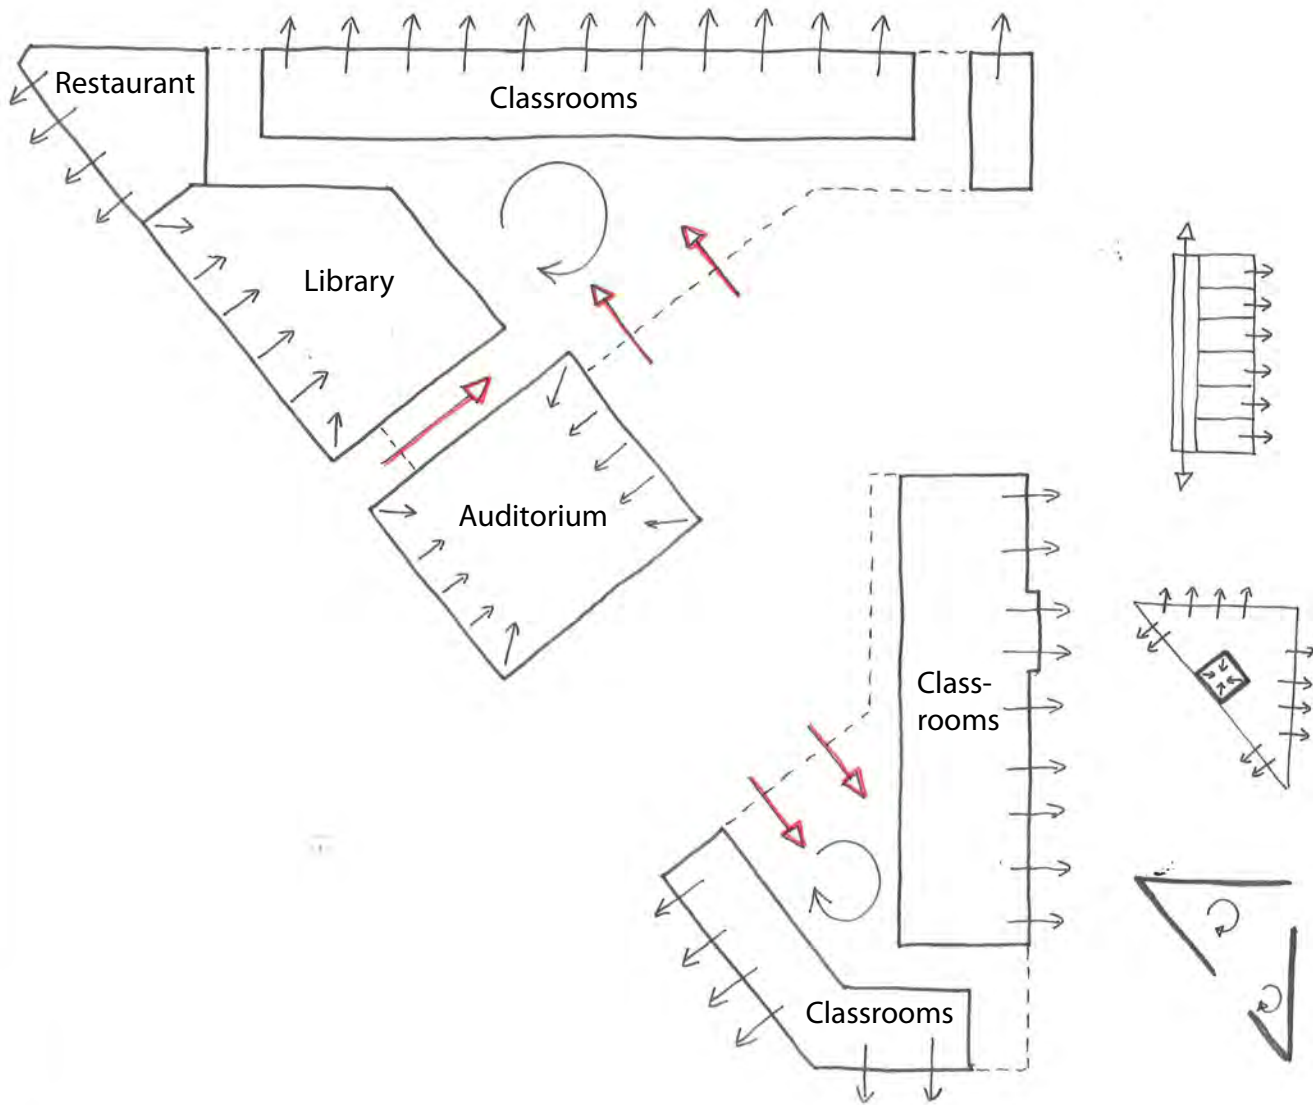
| Principle of floor plan: corridor with one side orientation | author, 2012
